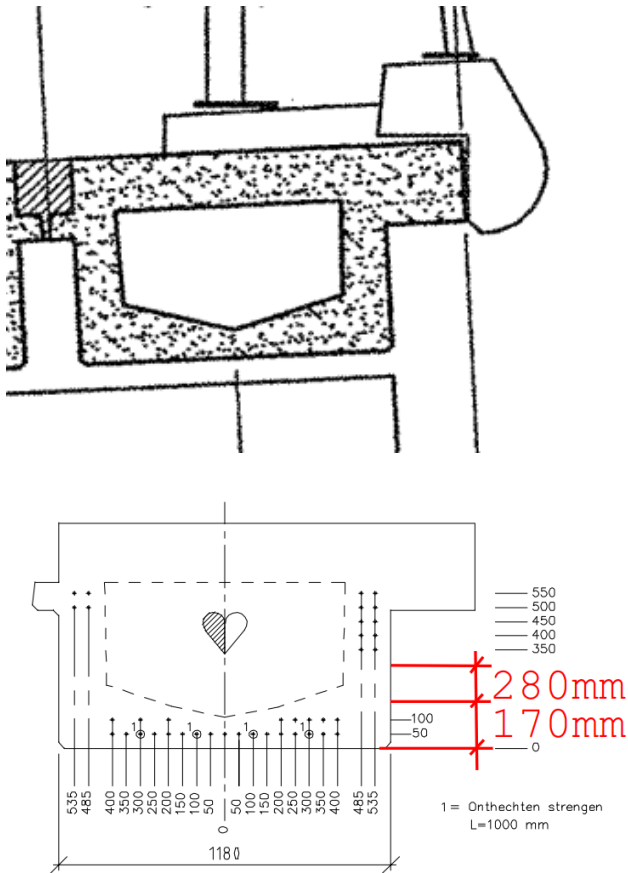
Cross-section of beam K1 with side element (top) and cross-section of beam K1 with vertical location of cores in beam (bottom).
